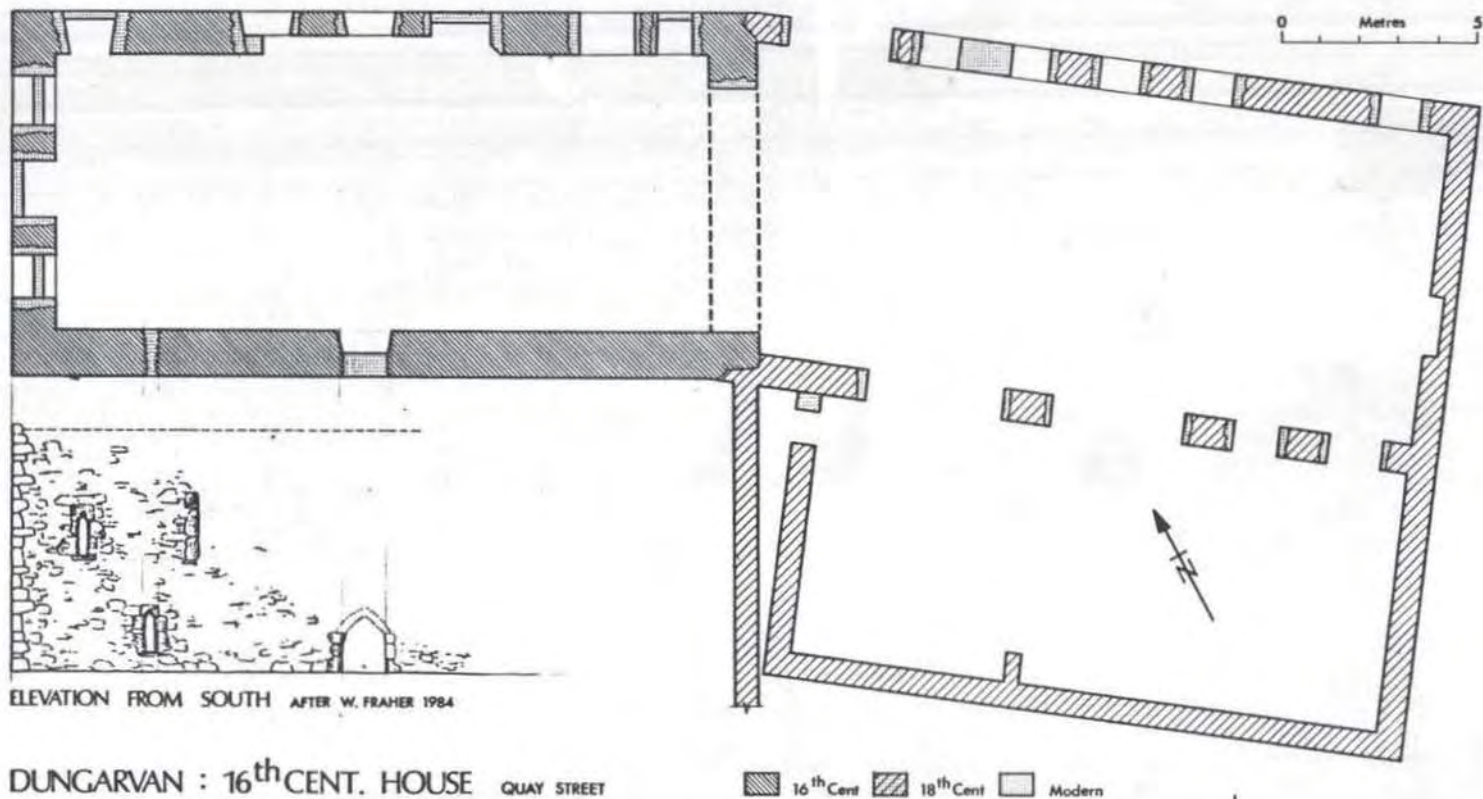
Dungarvan: house 2 ("Barry's Stores"): ground plan and south elevation.
